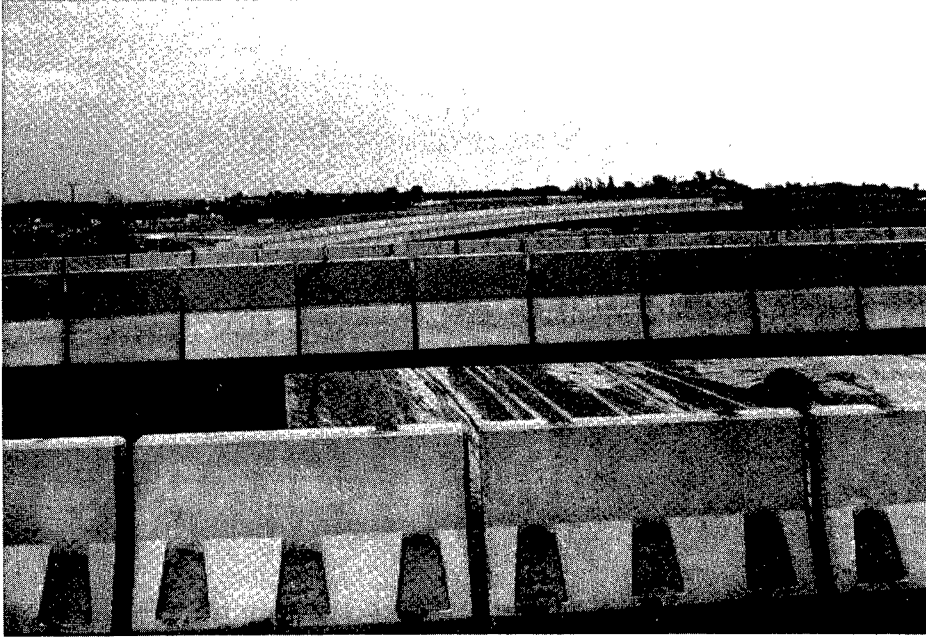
Precast bridge parapet walls. Bolted on panels. Madrid.
